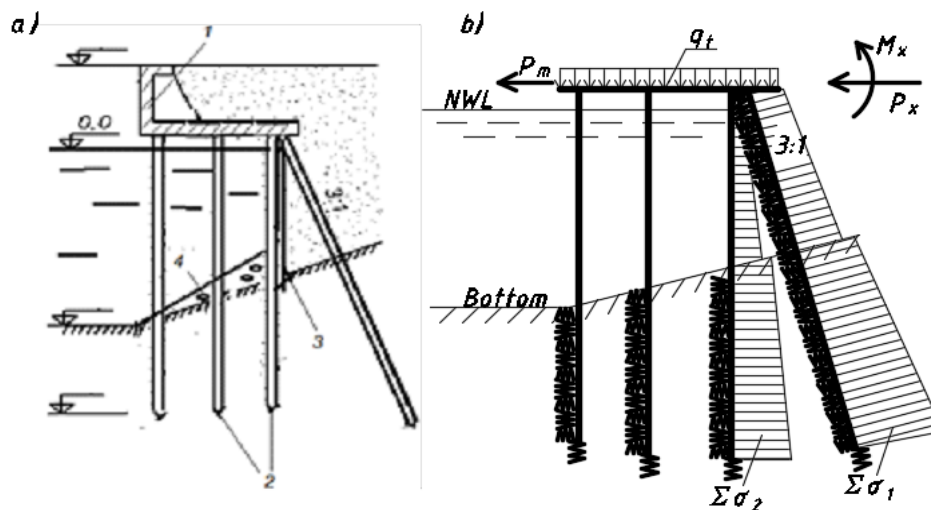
High pile grillage with back sheet pile wall: a –transverse section: 1 – grillage; 2– piles; 3 – protection of soil from dornit; 4 – riprap; b – design diagram. The legends: q_t – total vertical load; P_m – mooring load on the one running meter (1 rm); P_x, M_x – resultant active pressure on the grillage (superstructure) and moment from its; $\Sigma\sigma_1, \Sigma\sigma_2$ – diagrams of resulting pressure on the sheet pile wall and inclined pile. The darkened part of the piles' elements of the construction in ground (in the form of springs in two directions) represents the use of the generalized model of Fuss-Winkler
